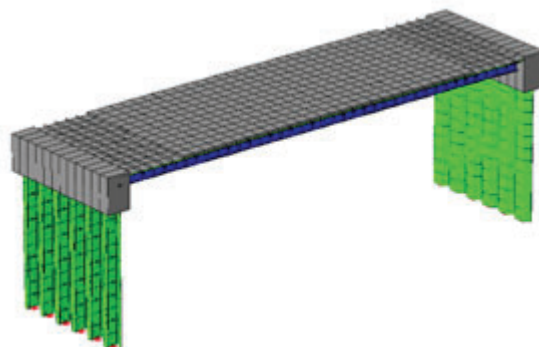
Numerical model of sample bridge with sheet-pile abutments
